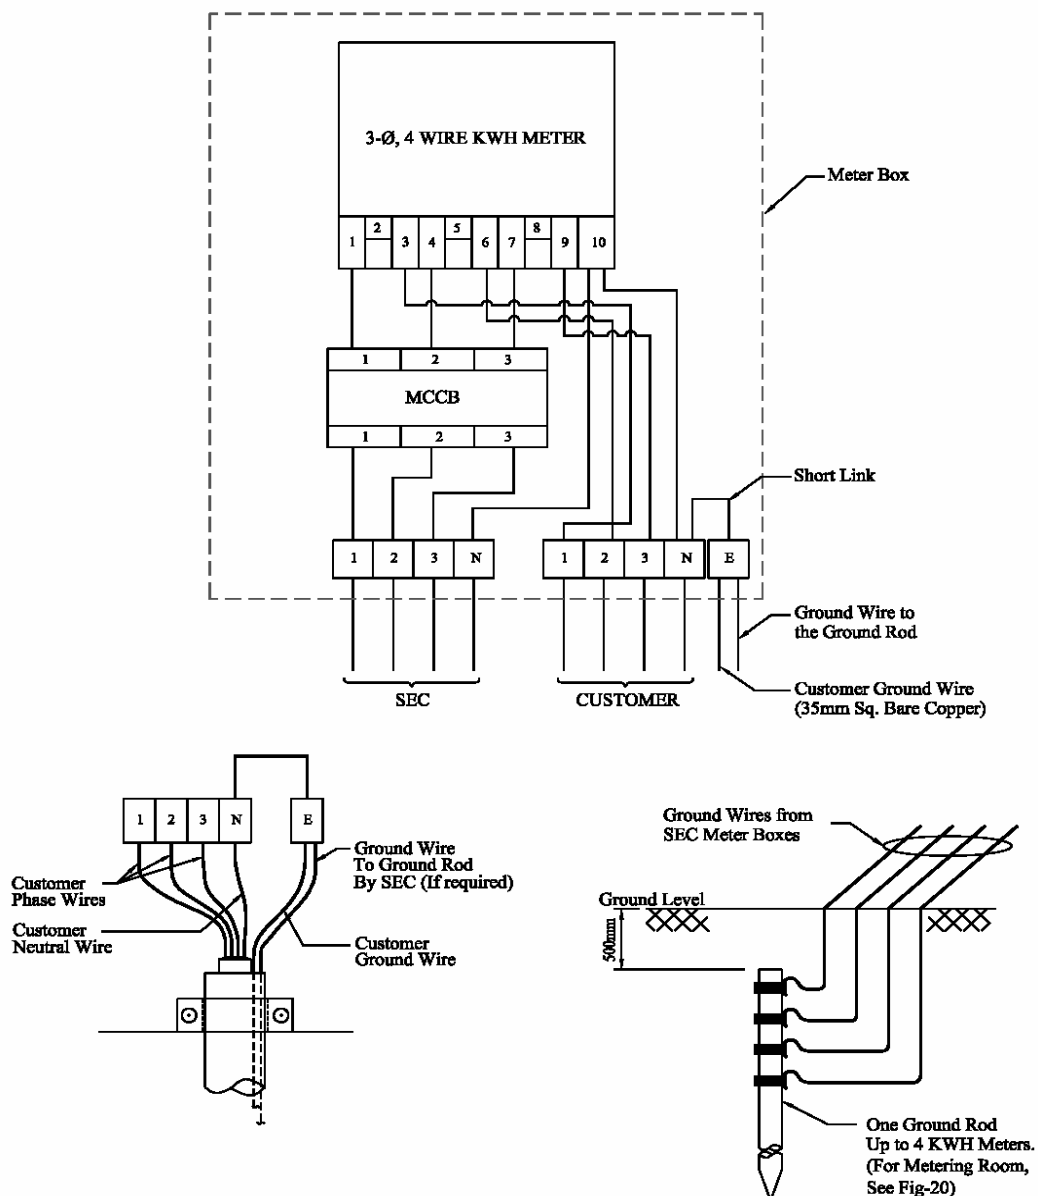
WHOLE CURRENT KWH-METERS GROUNDING INSTALLATION
